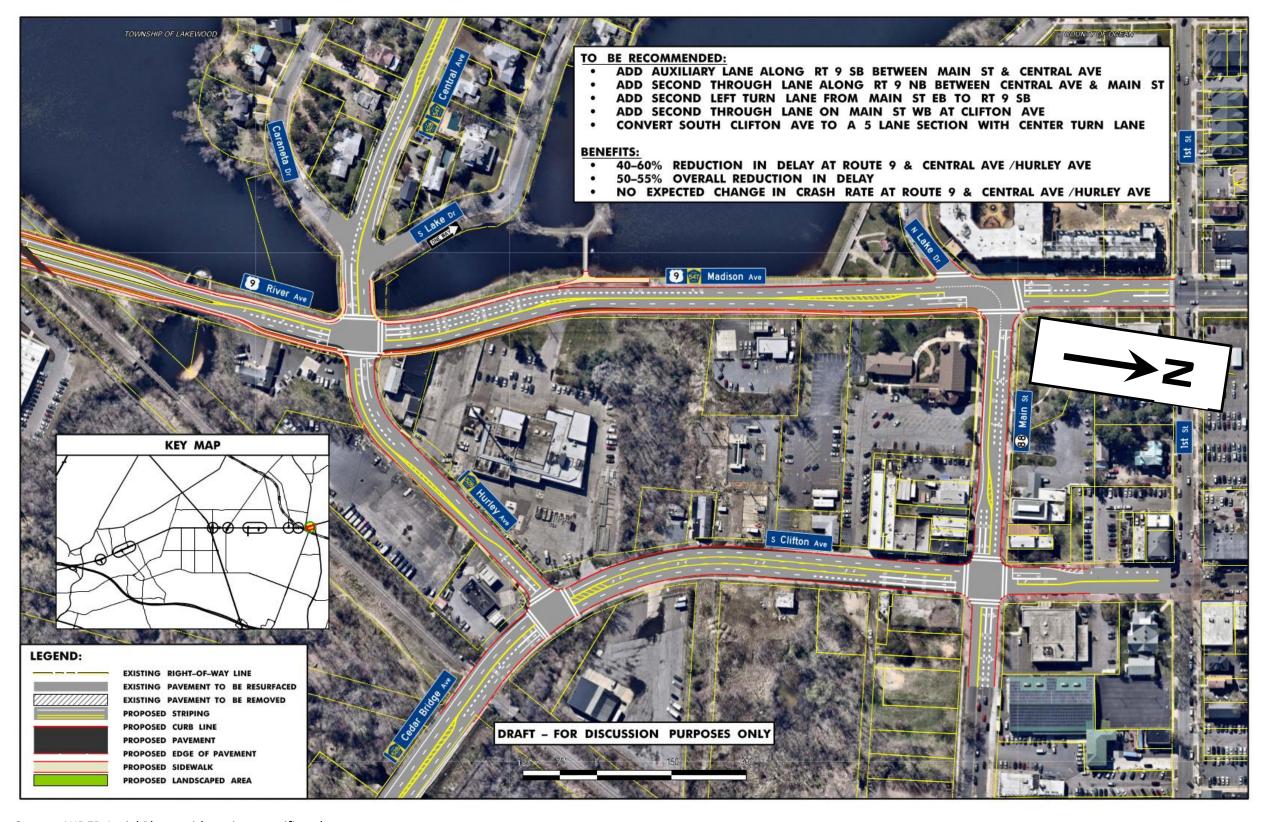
Improvements to Main Street, Central Avenue and Hurley Avenue, Scheme A
